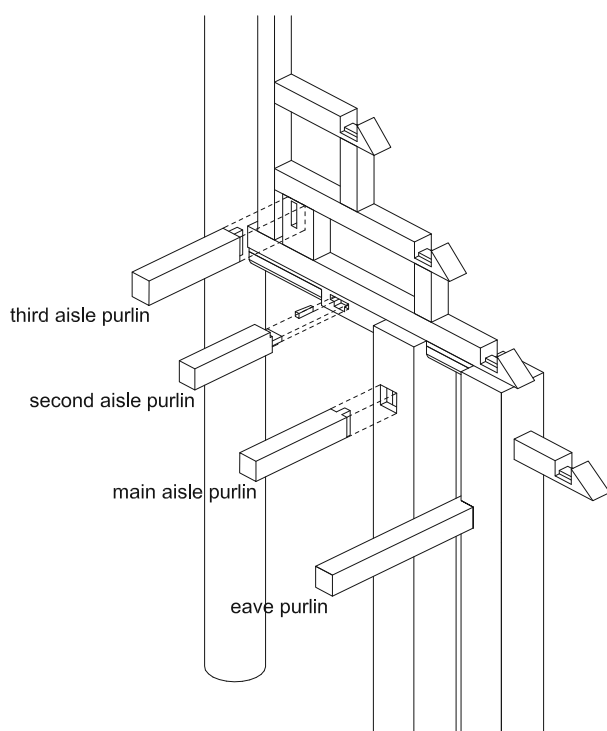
Purlins from the first bay meeting the second transverse frame in aisle roof
